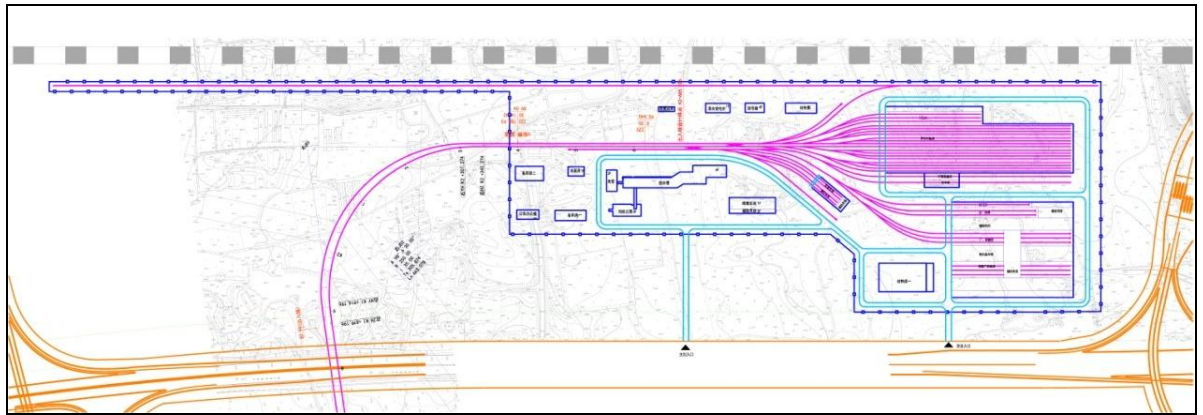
Layout Plan of Hanghai east Road Parking Lot
